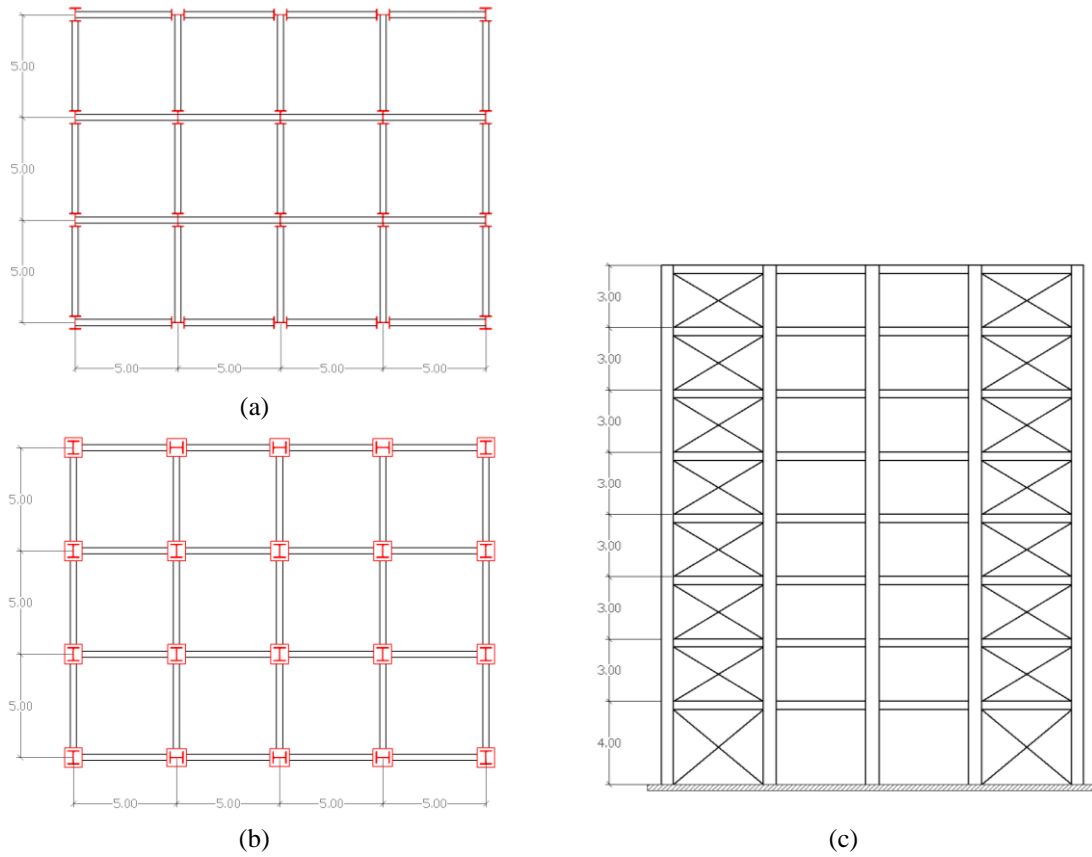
Test examples - (a) steel building plan view, (b) steel-reinforced concrete composite building plan view and (c) eight storey steel building front view
